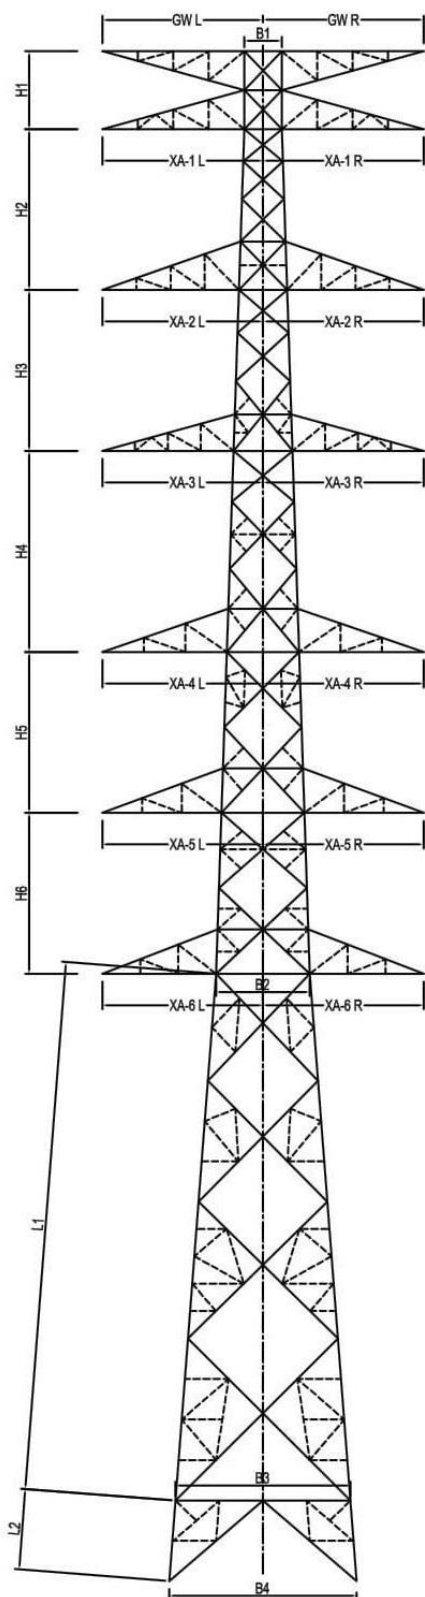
Schematic Drawing of 230kV Four Circuit Tower
